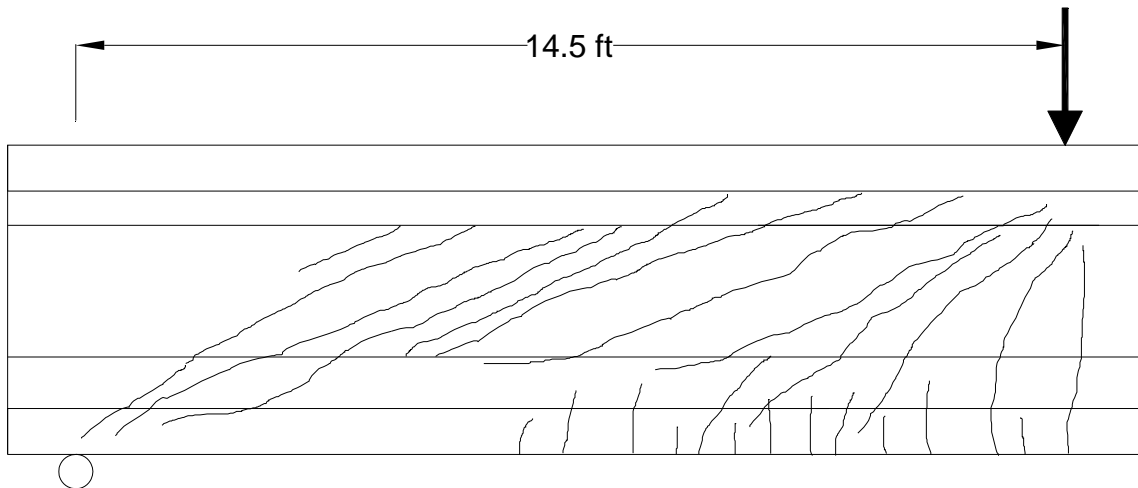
Cracking at 44% Past Peak Applied Load (Specimen II)
